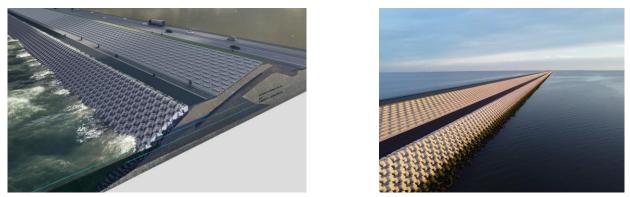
Visual of a typical dam cross-section (left) and after finishing construction (right)
